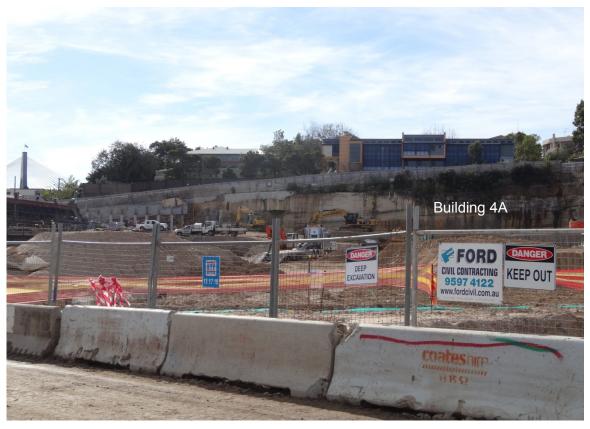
Looking east towards the cliff face and Building 4A location. Maxwell Road and the Glebe neighbourhood are located behind the cliff
